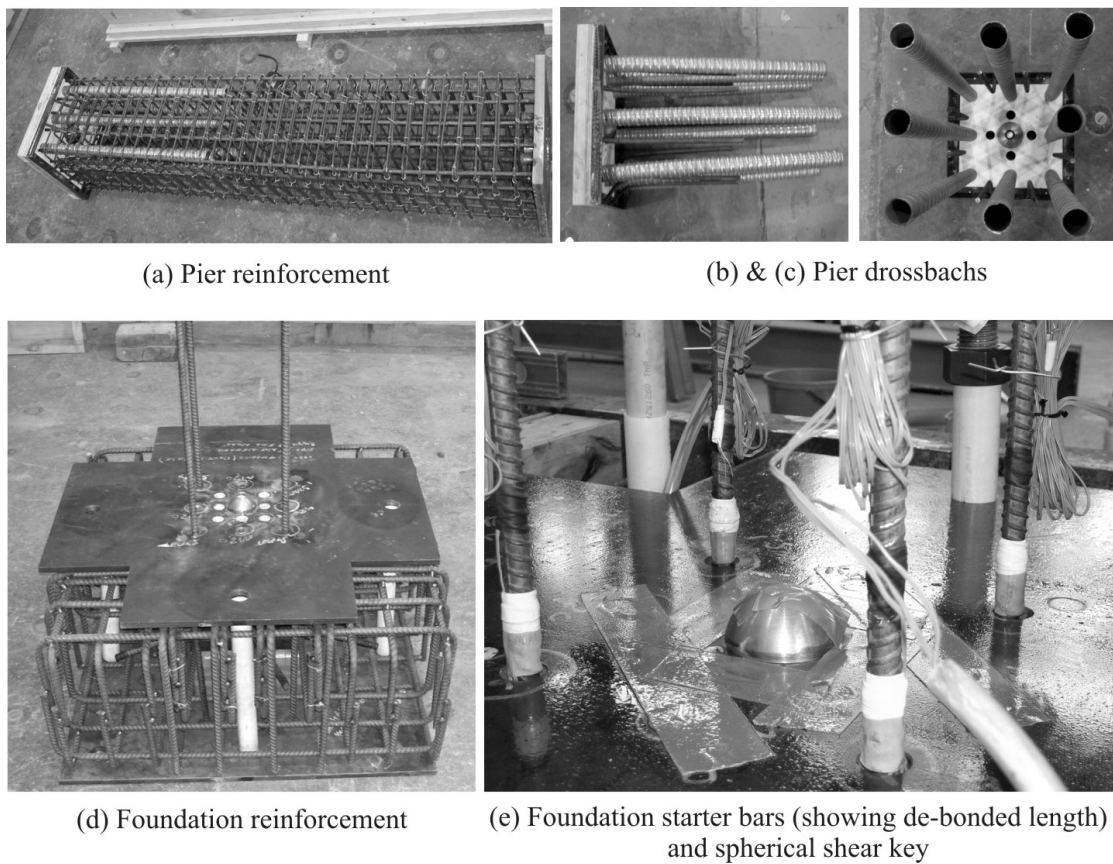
Shear transfer mechanism and torsion control for the post-tensioned piers
